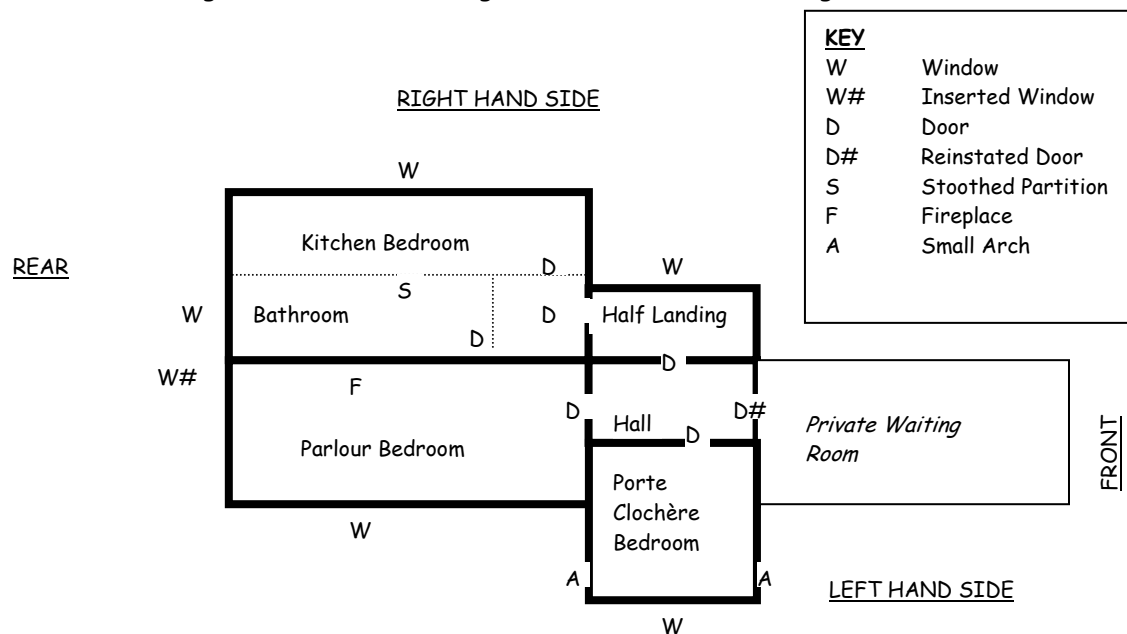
DOMESTIC ACCOMMODATION - FIRST FLOOR
